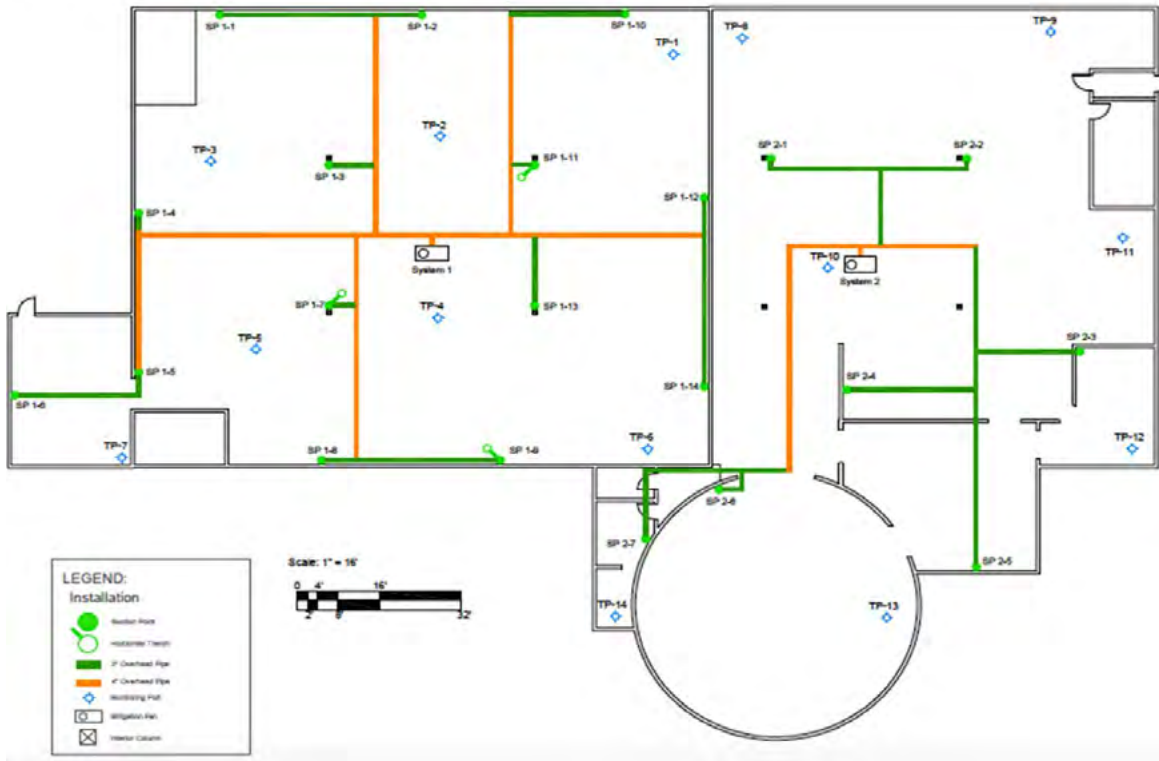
NYC SUBURB BUILDING SYSTEM DESIGN
